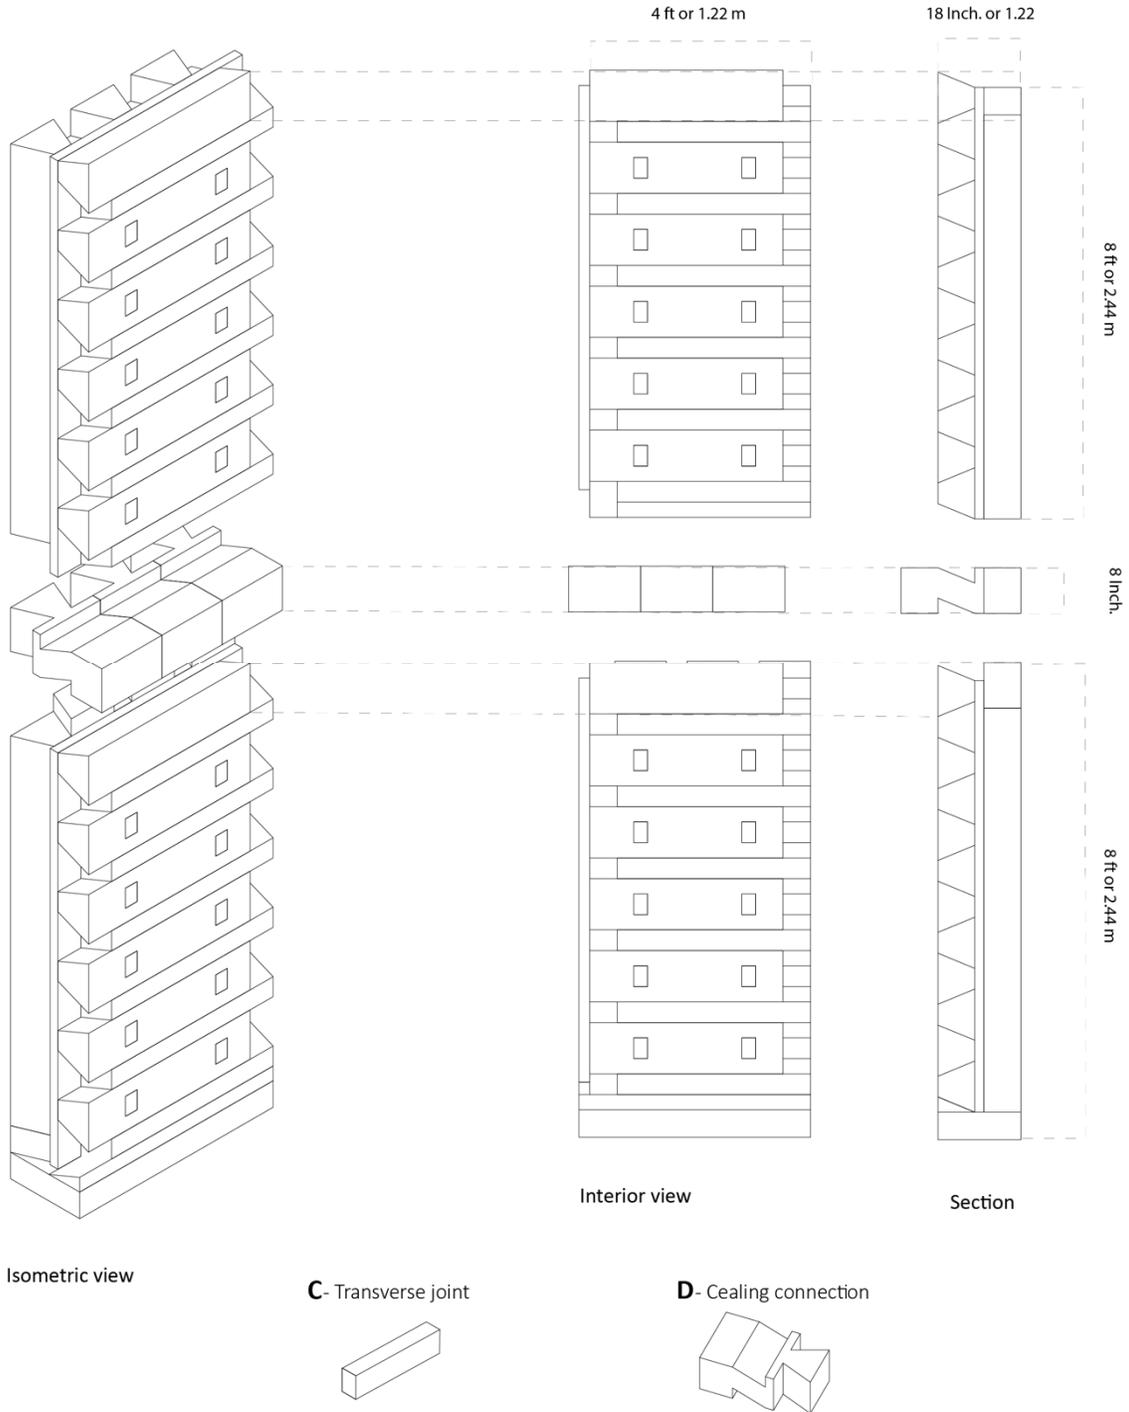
Prototype three, Wall and ceiling connections (2018)
